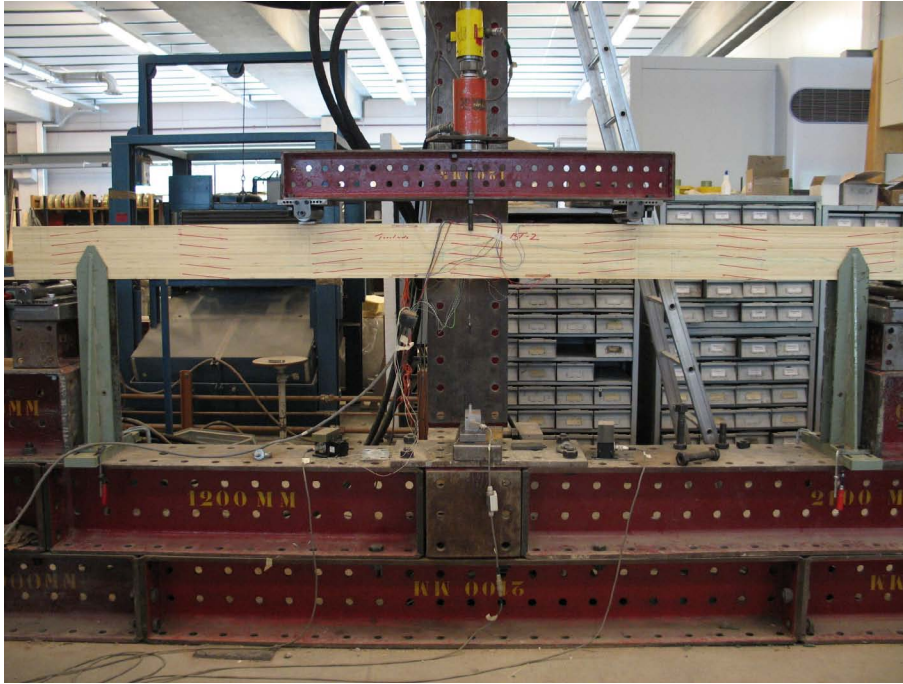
Test setup of four-point bending test on laminated bamboo beams
